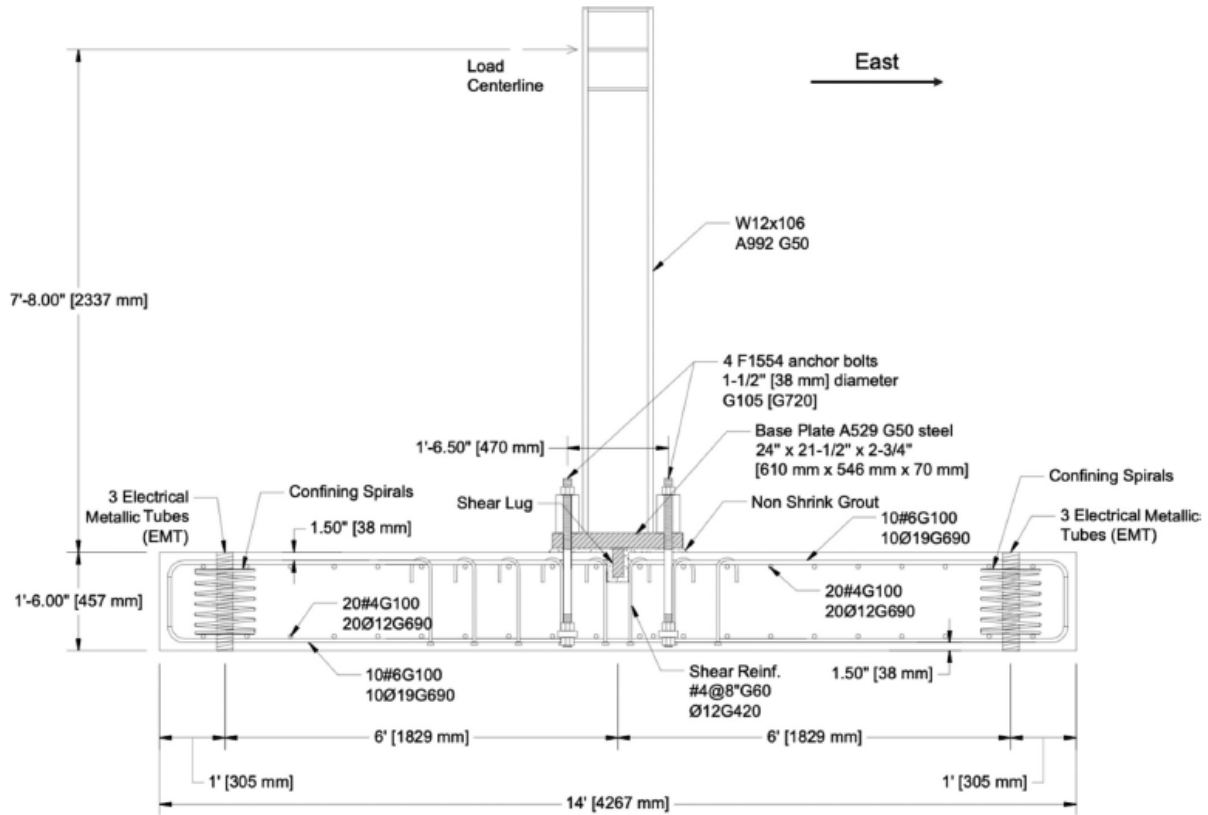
Steel-column-to-concrete-foundation joint specimen M02 (Worsfold et al. 2022)
